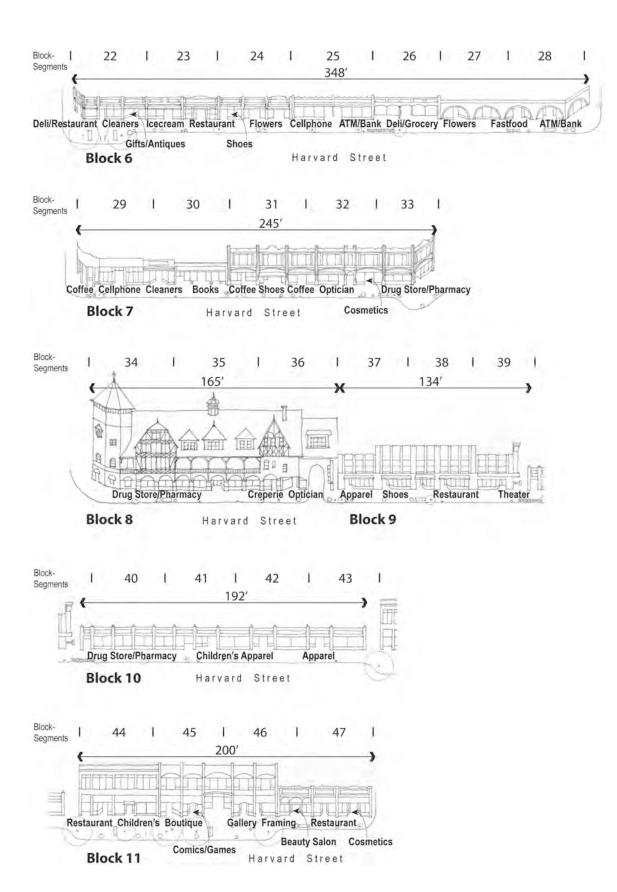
A combined plan and elevation of six blocks studied on Harvard Street
